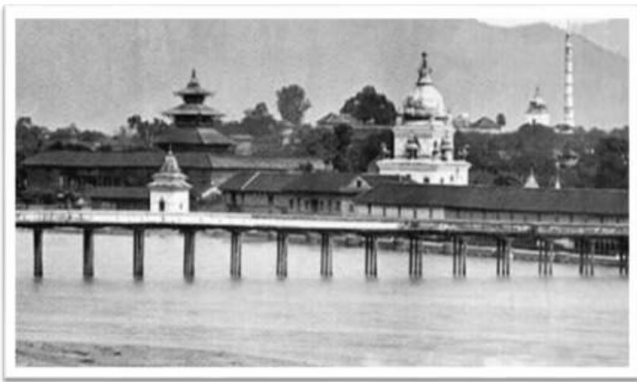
First timber bridge built at thapathali over bagmati river, Kathmandu.
